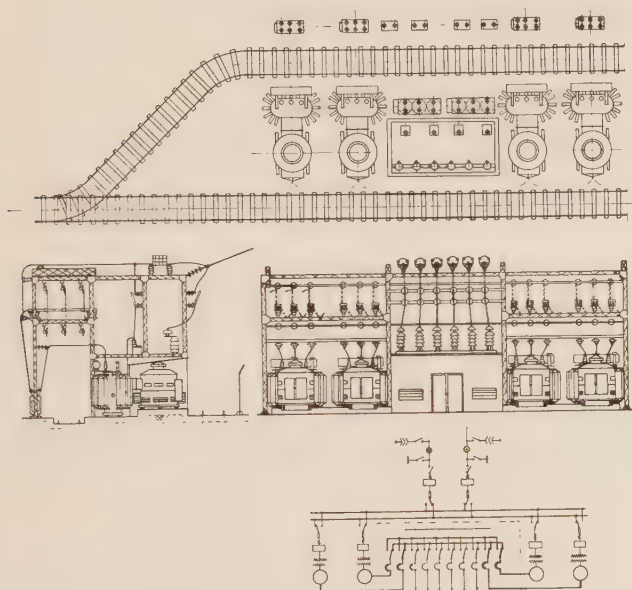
PROJECT OF LAYOUT OF OUTDOOR RECTIFIER SUBSTATION
